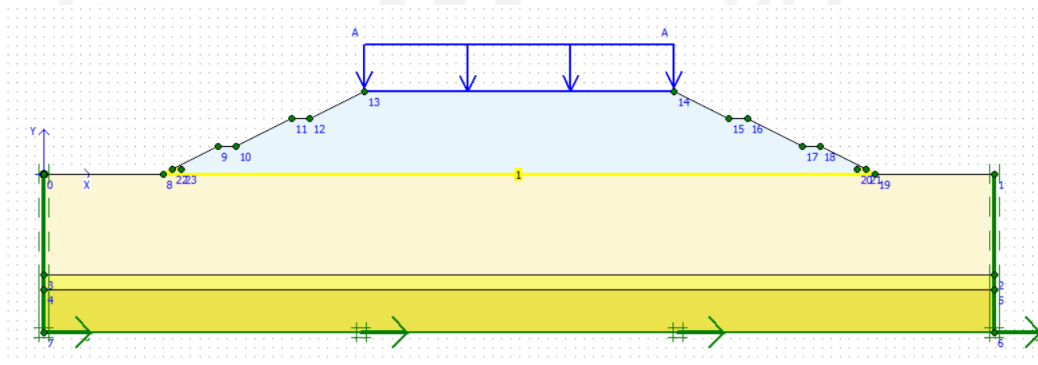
Embankment 2 Trap with Geotextile Reinforcement
